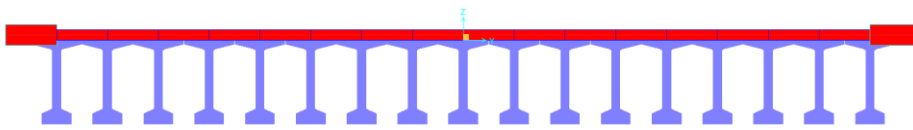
view of V14 Bridge (similar in V03 and V08 Bridges)
